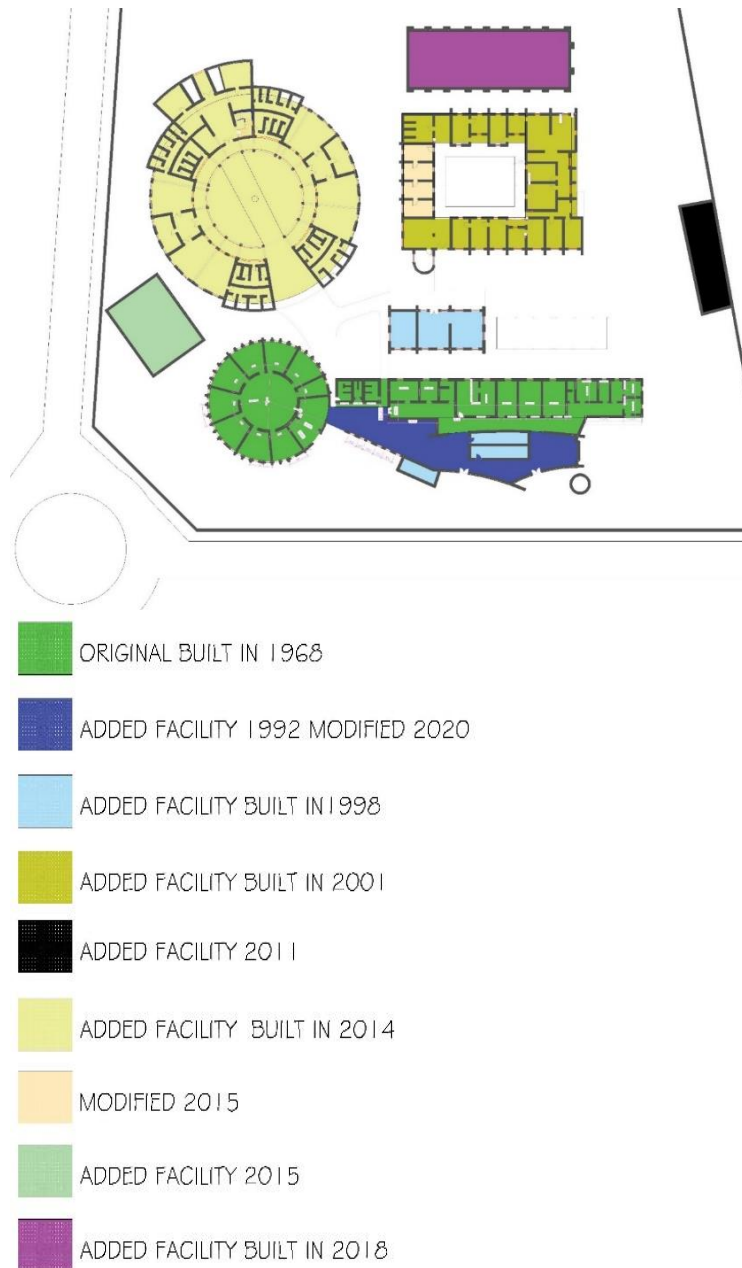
Image of Ahmadu Bello University Medical Centre. Zaria Samaru Campus Floor Plan.
